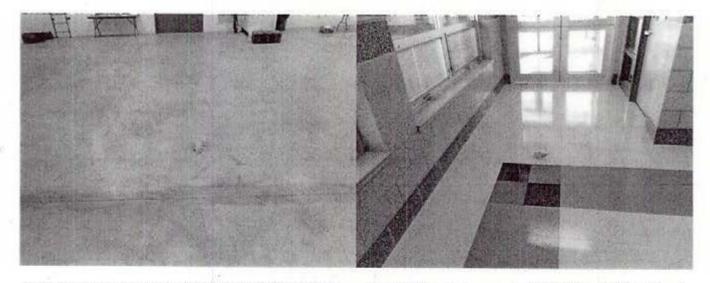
Lead wipe sample (100314-HA-W-05) collected from the drill floor; center.
